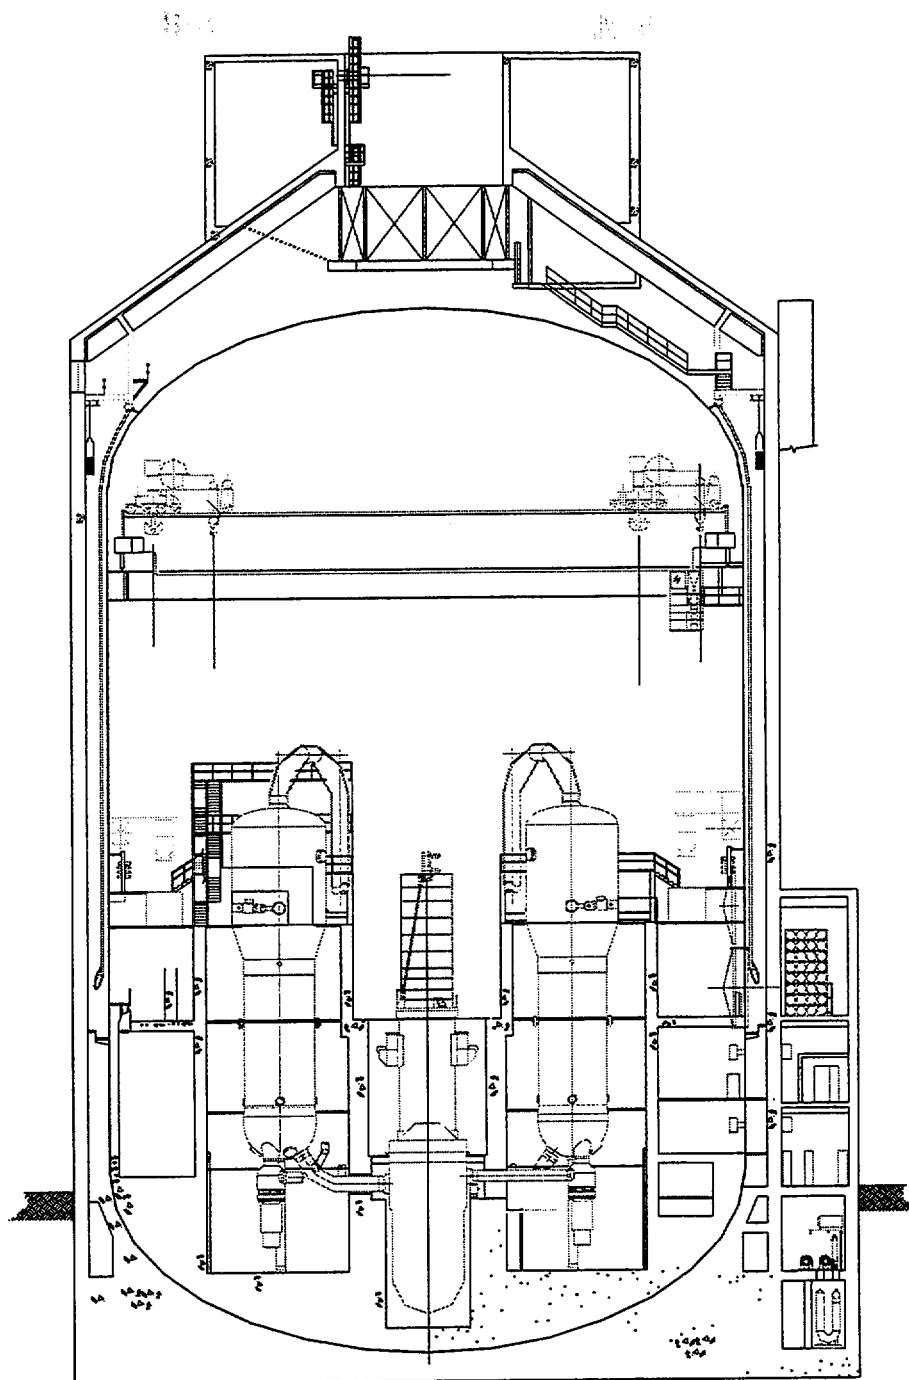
AP1000 Containment and Shield Building Elevation View
